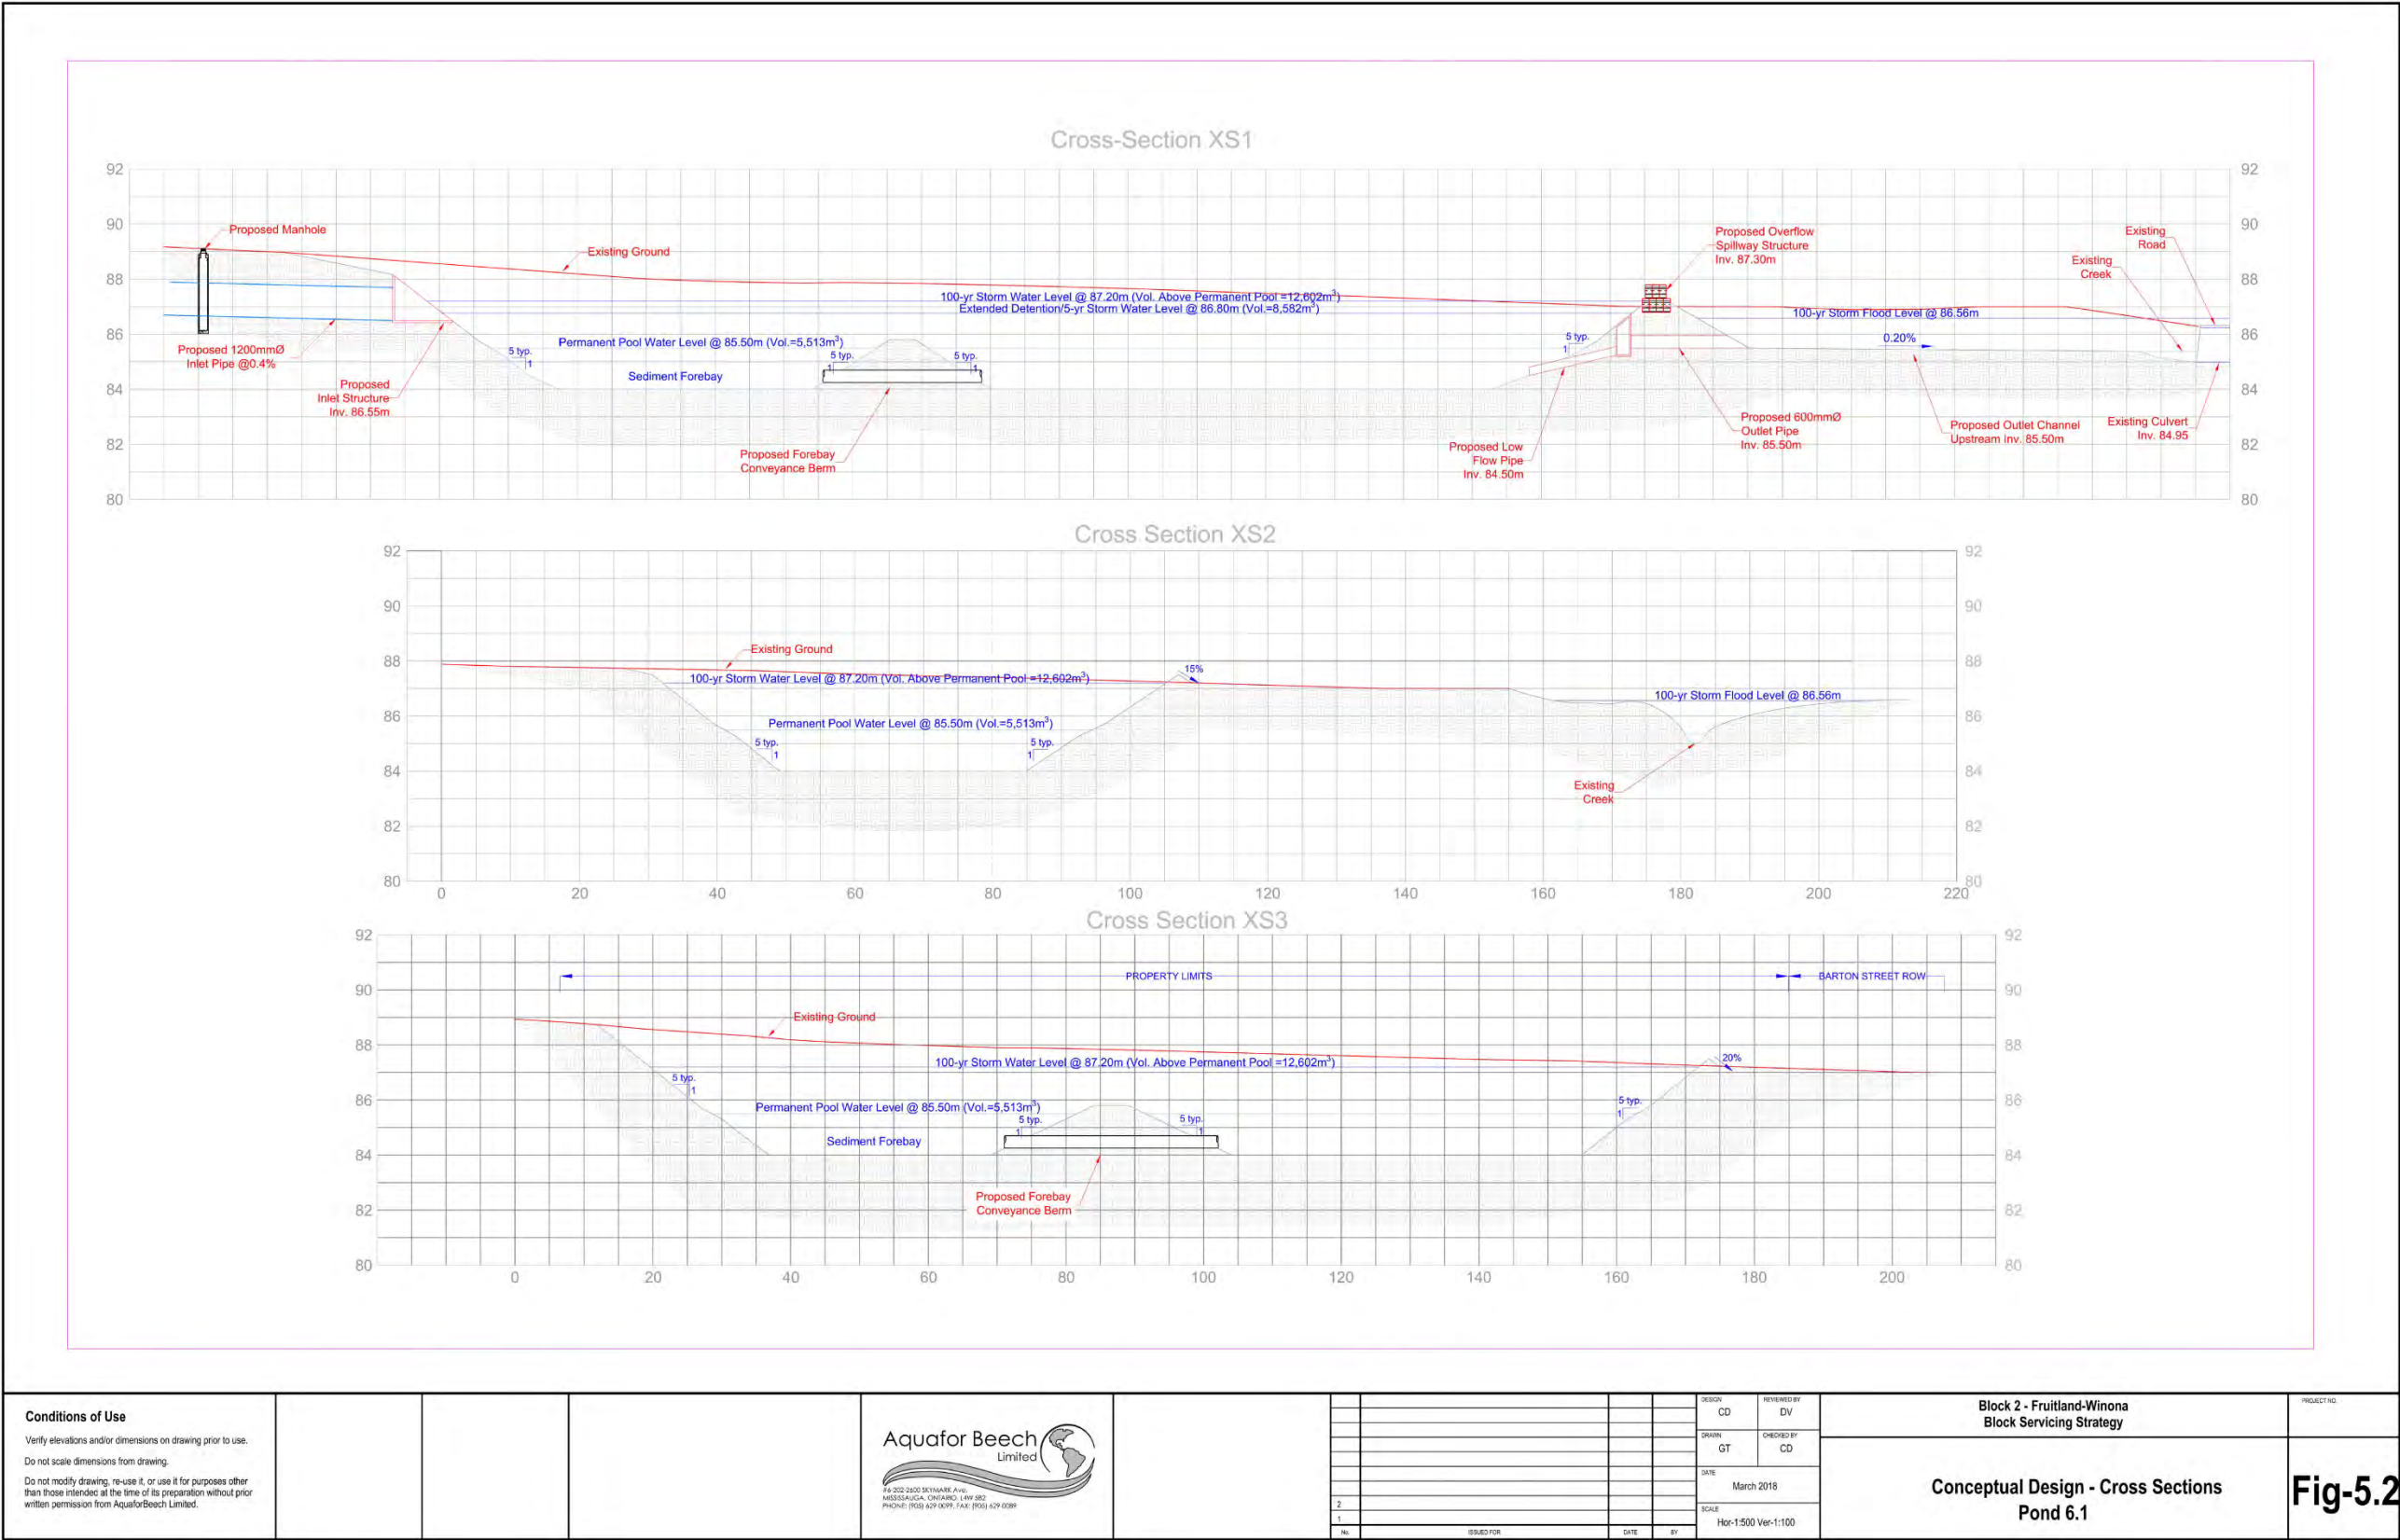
Pond 6.0 Conceptual Design – Cross-Sections
